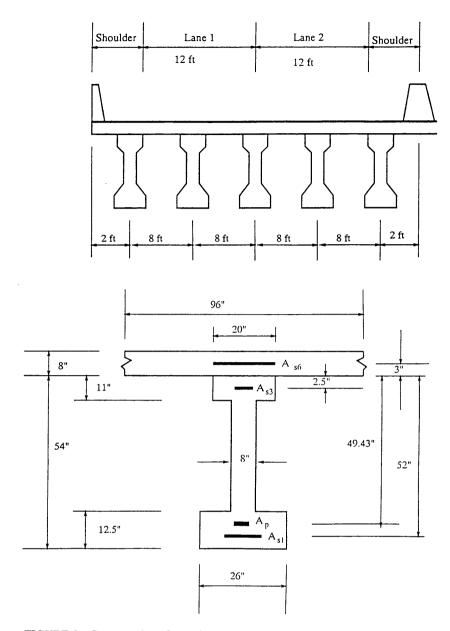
Cross section of a typical slab-and-girder bridge.
